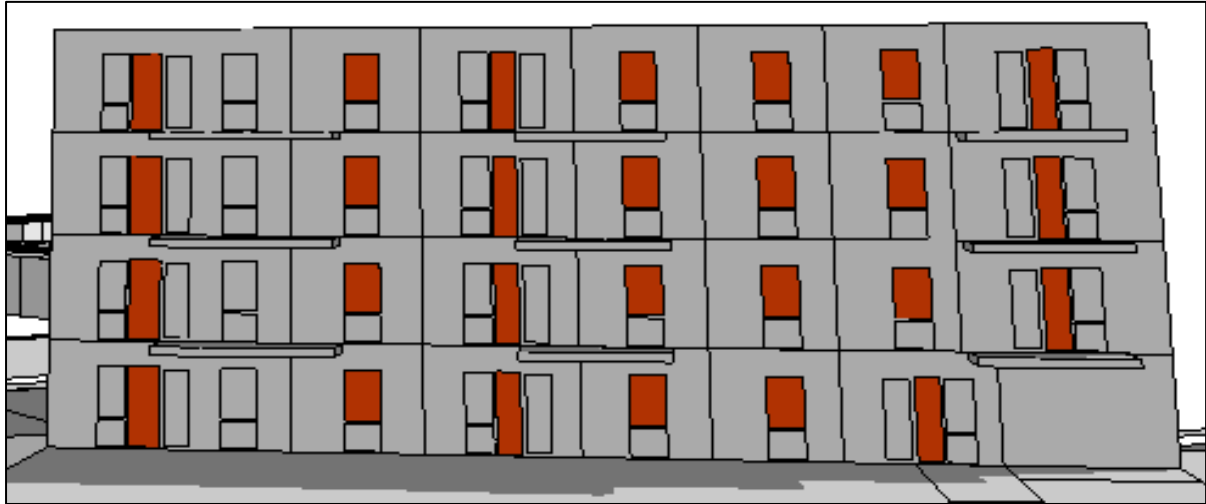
Windows achieving 1.5 hours of sunlight - West elevation of Building 01 (modelling software)
